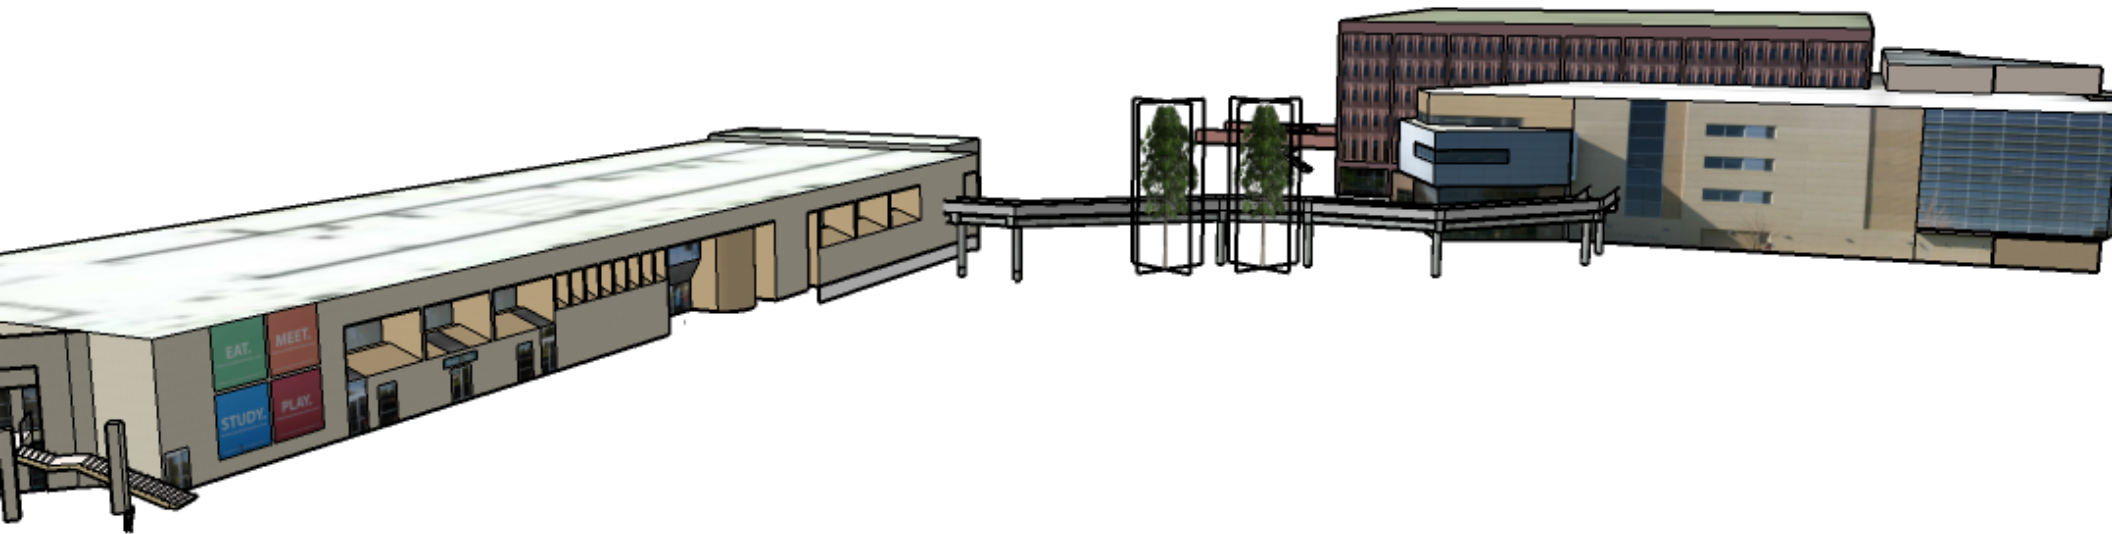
Overview of the BSC, Library, and Bridge. Bridge was drawn in SketchUp.
